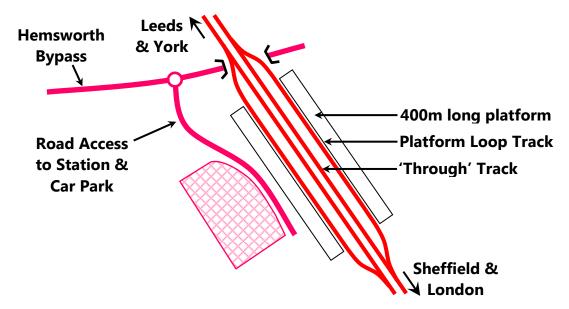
Indicative Track Arrangement at new HS2 Hemsworth Parkway
